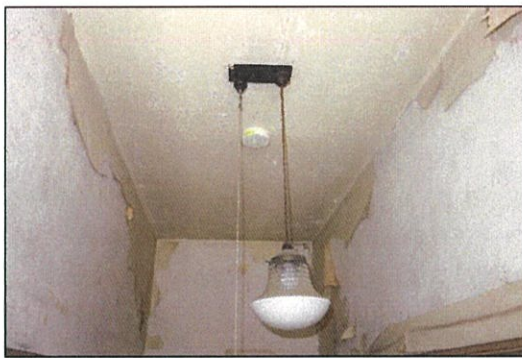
View to cracked and flaking plaster ceiling, hallway.
